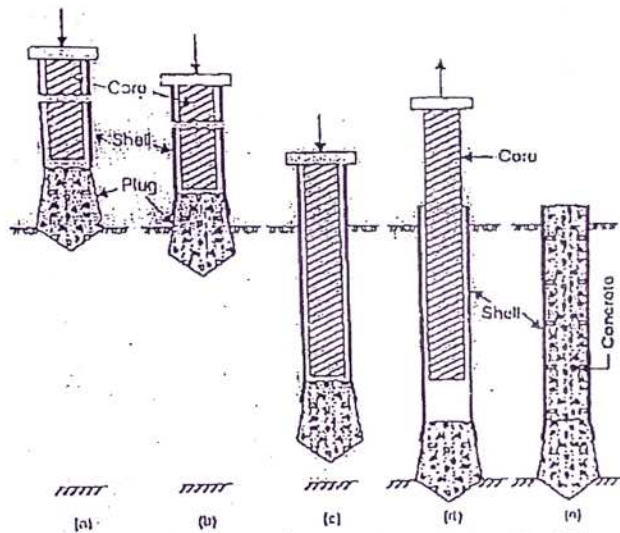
STAGES IN SWAGE PILE CONSTRUCTION
